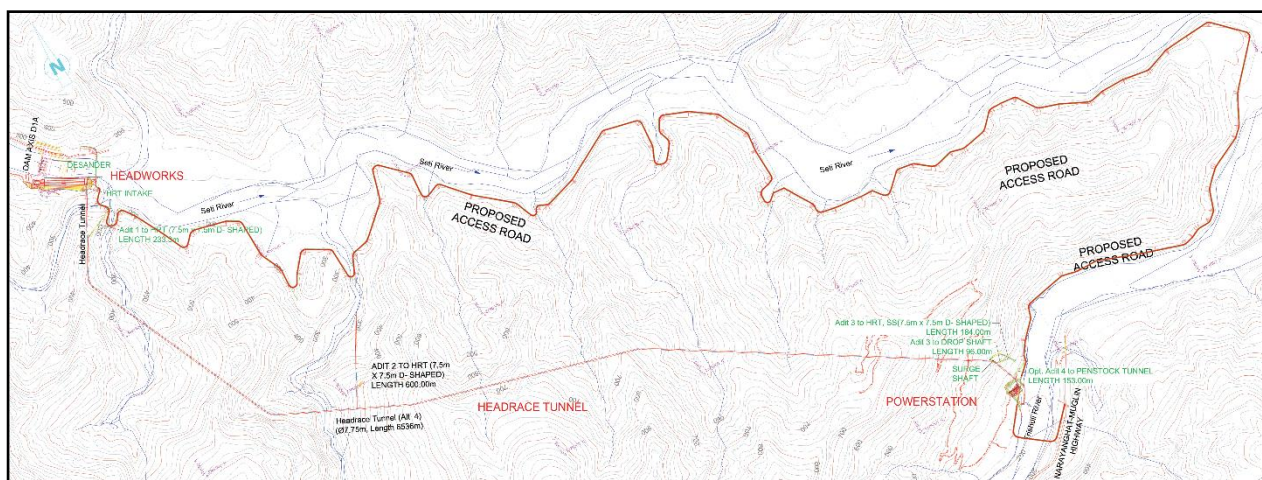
Project Access Roads (Source: Detail Design Report, 2021)
